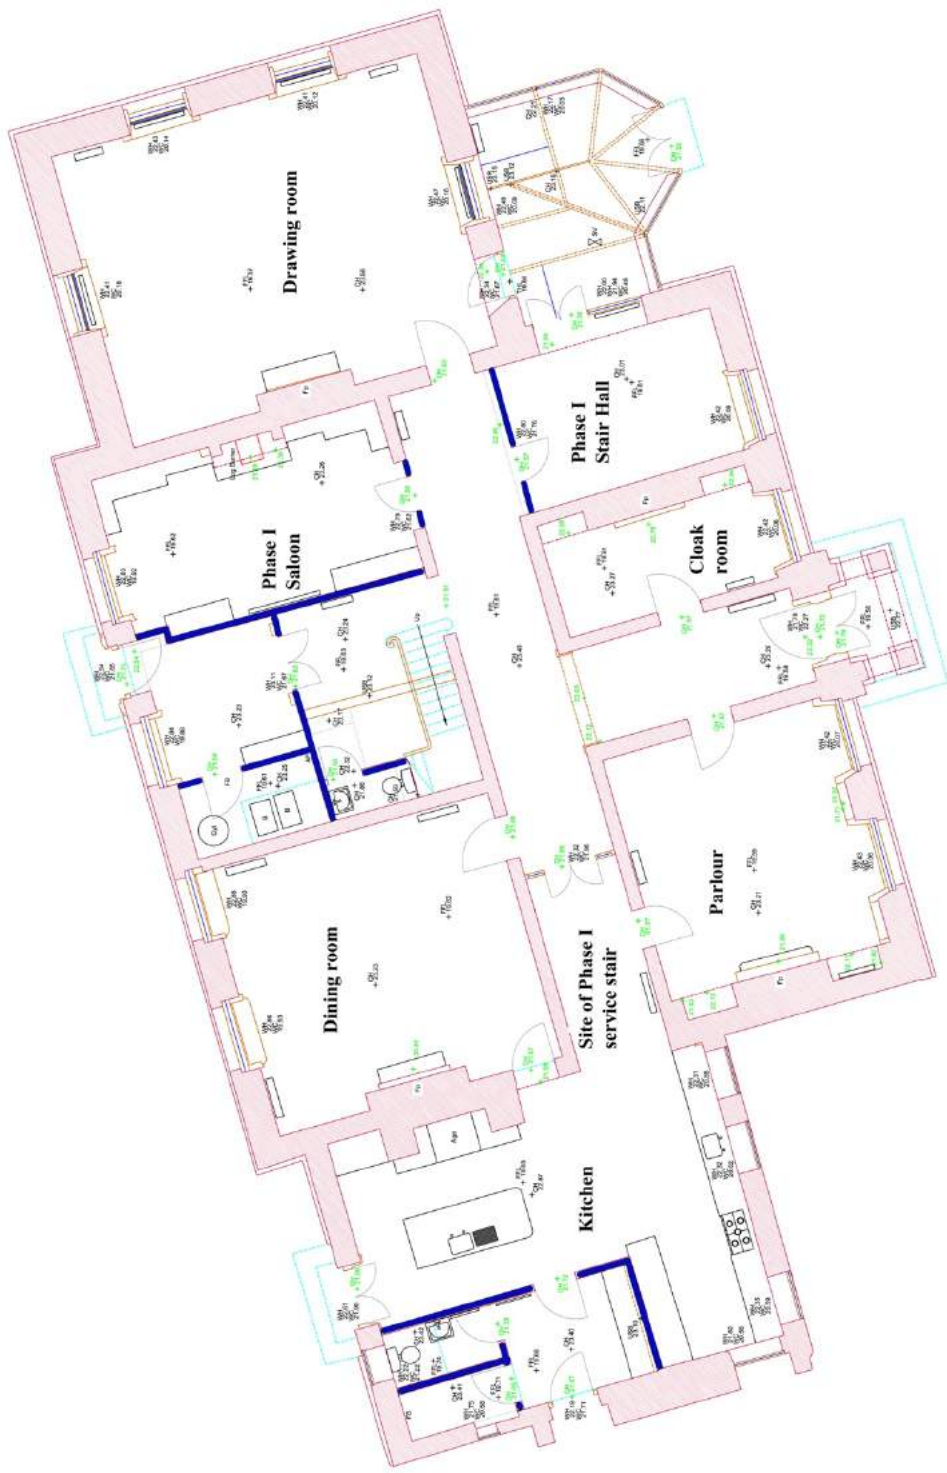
Ground floor key plan: historic room functions; and inserted walls in blue
